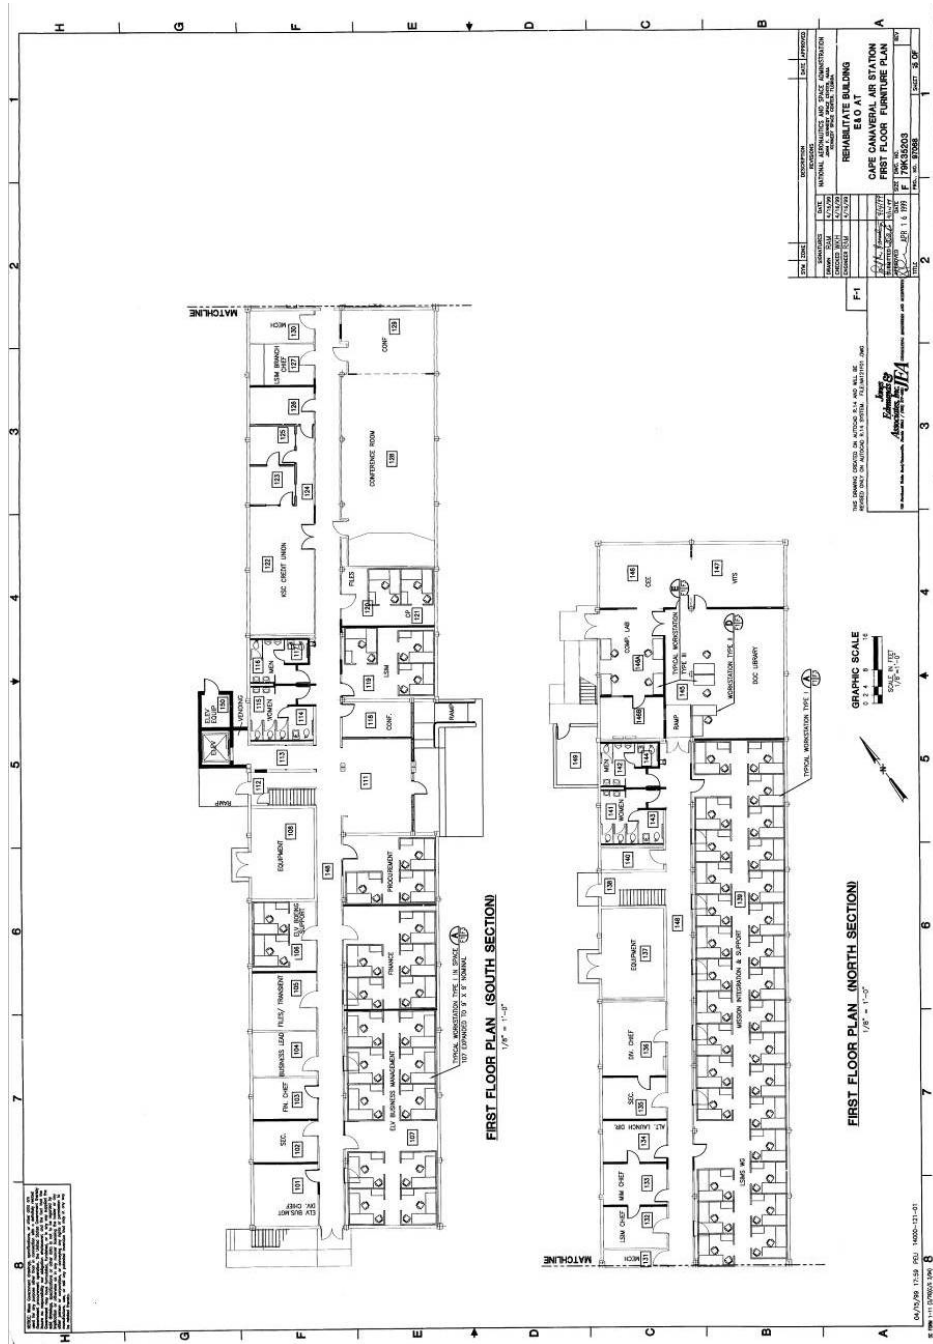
Jones, Edmunds & Assoc., Rehabilitate Building E&O at Cape Canaveral Air Station, First Floor Furniture Plan, April 1999, Sheet 15.
